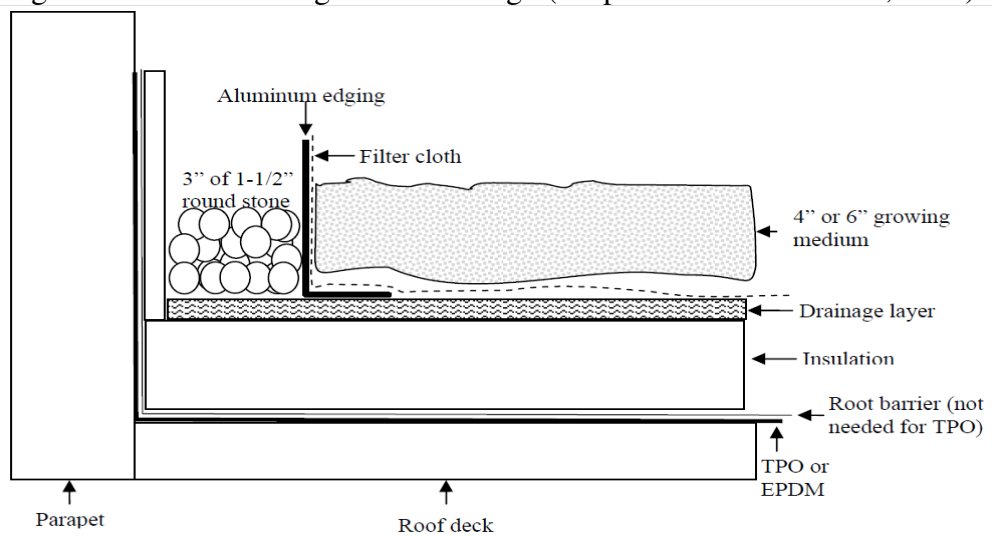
Cross section of green roof design (adopted from Seters et al., 2013)
